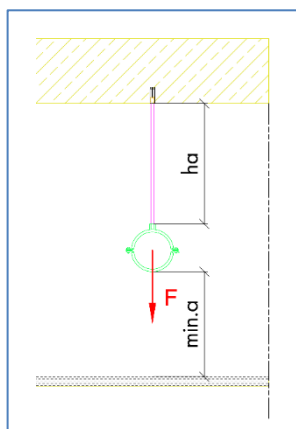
shows an example of a Würth TIPP-pipe clamp in the plenum of a suspended ceiling construction, in accordance with the Specimen guideline on fire protection requirements pertaining to conduits (Specimen Conduit Guideline [German designation: MLAR]), edition of 10/02/2015, section 3.5.3.)
